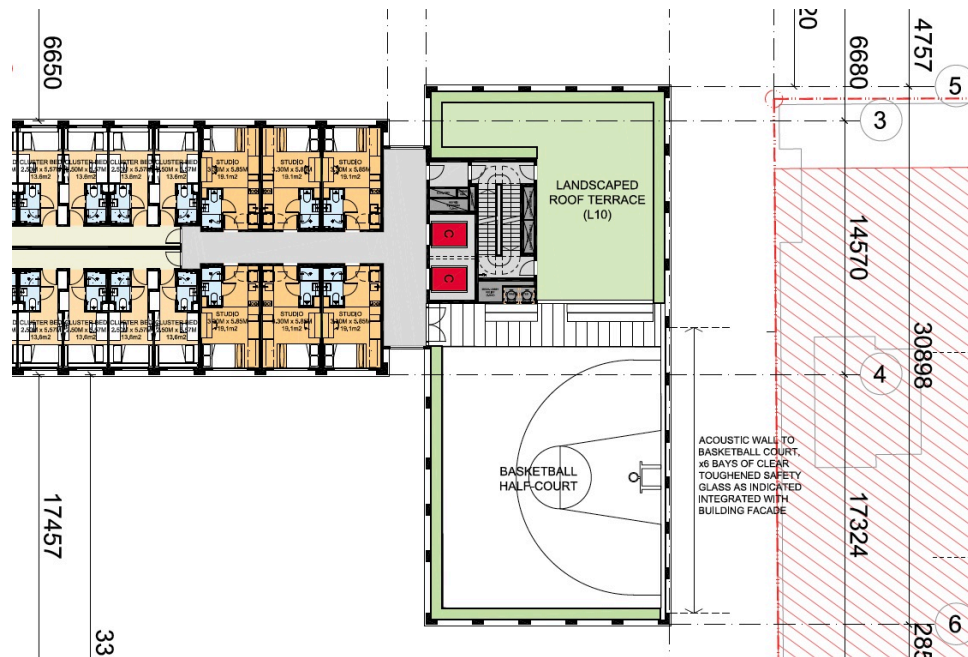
Updated Architectural plans to illustrate the location of the acoustic wall on the rooftop Level 10 northern elevation (DA03.010_L10)
